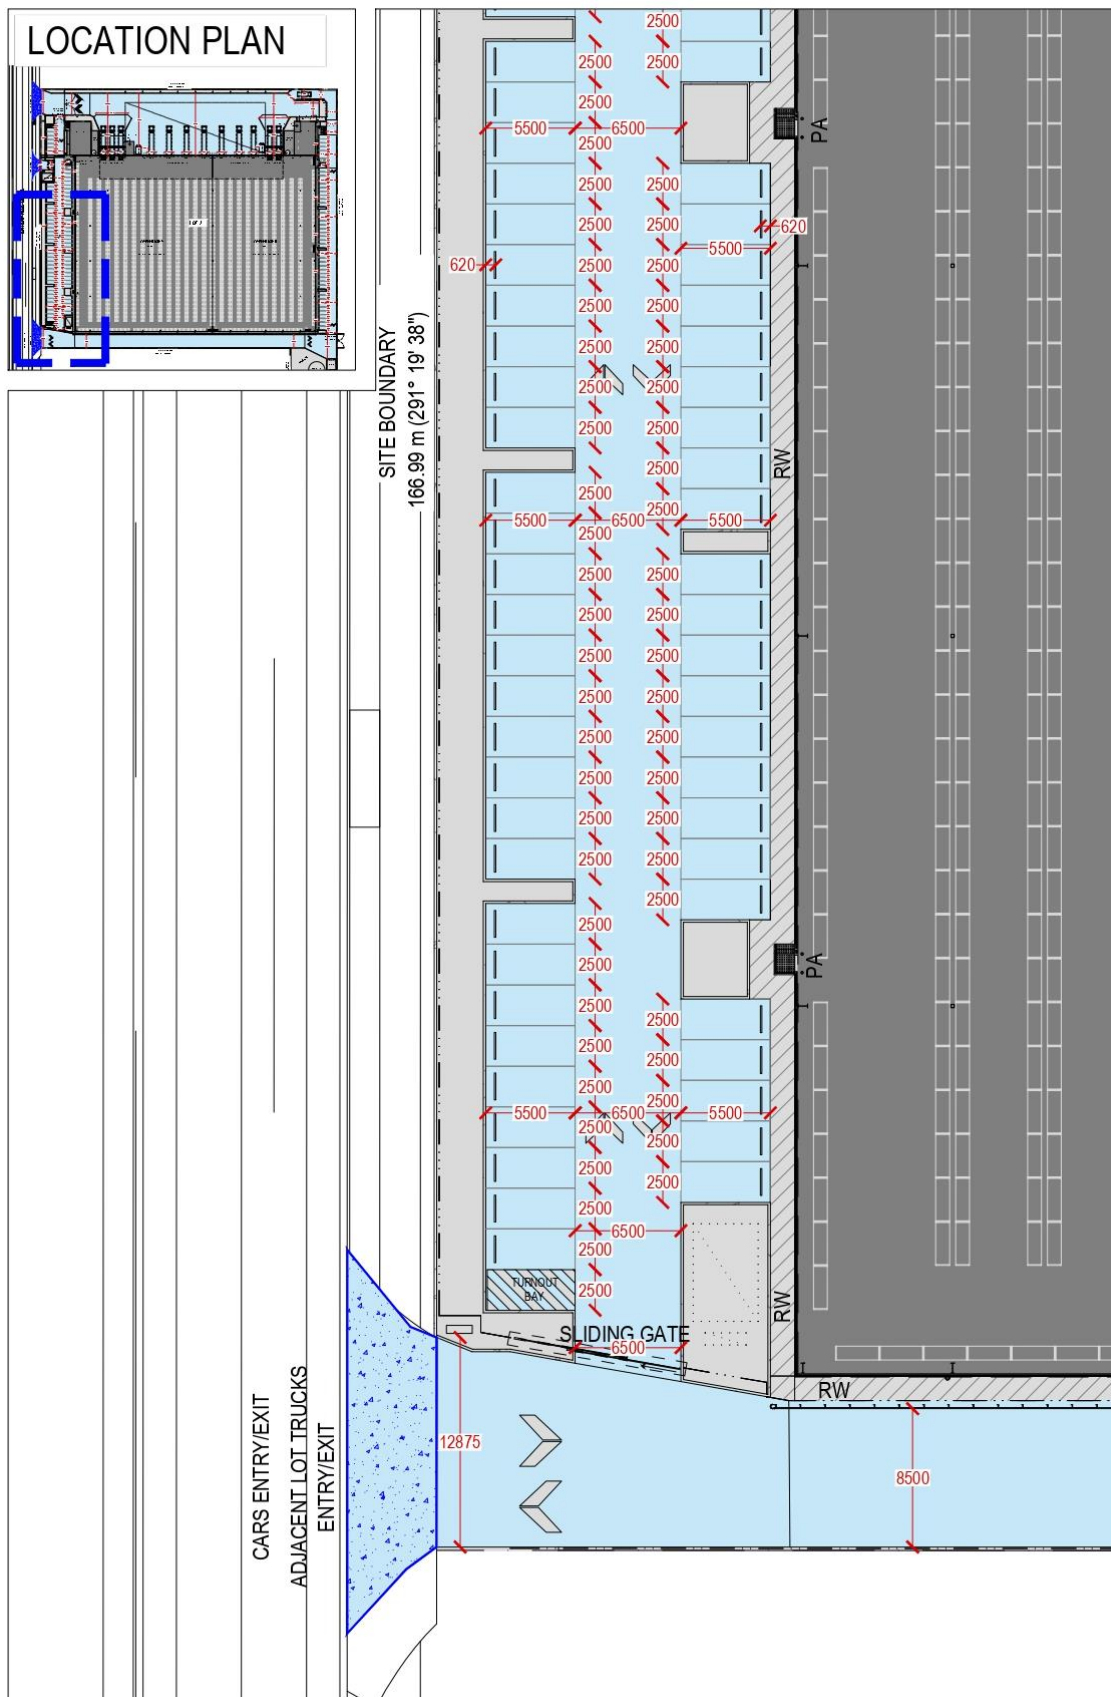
PROPOSED CAR PARKING LAYOUT AND DIMENSIONS
